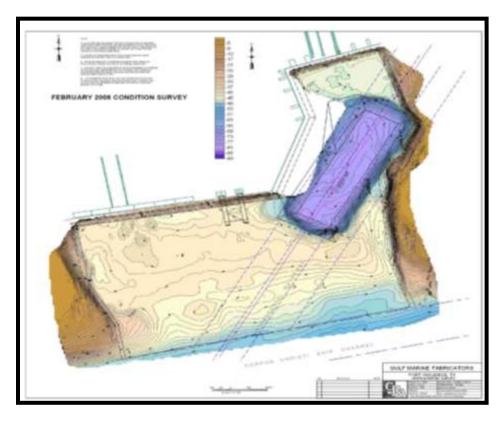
Gulf Marine Fabricators (Drawing courtesy of Gulf Marine Fabricators)
